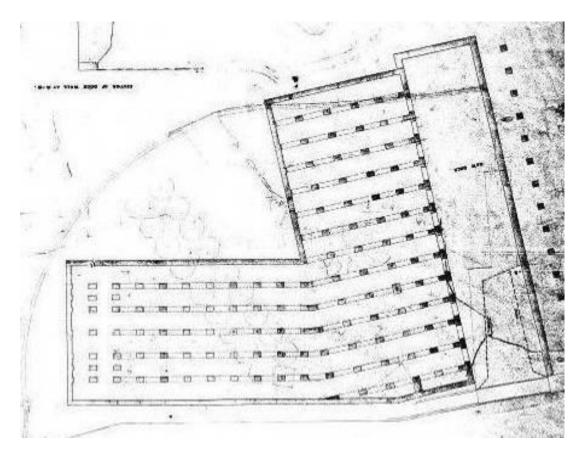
Plan showing old and new Dock and the Vaults, c. 1856
